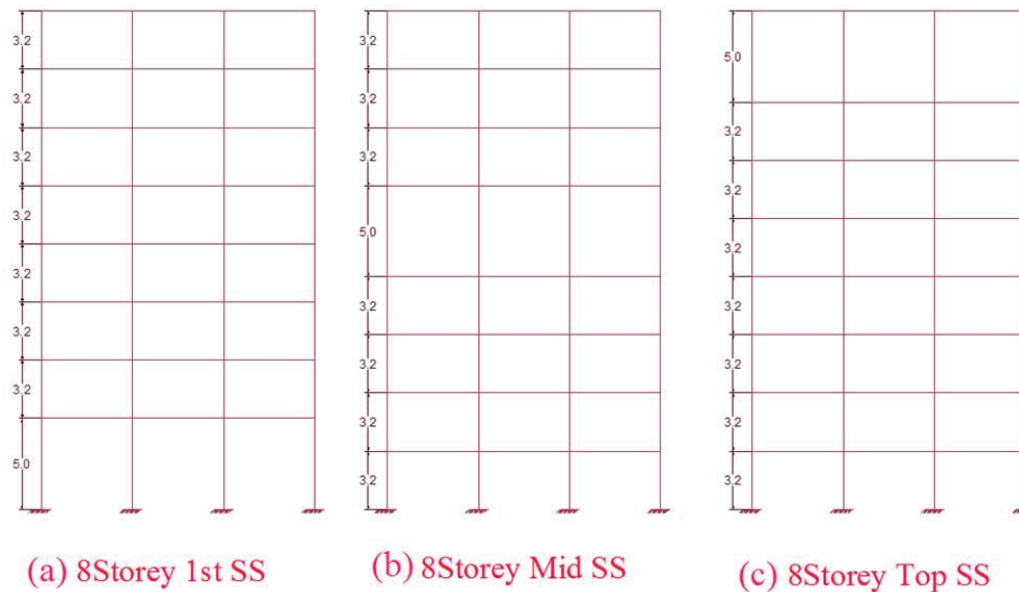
8-storey configuration, (a) SS at 1<sup>st</sup> floor (b) SS at middle floor (c) SS at last floor
